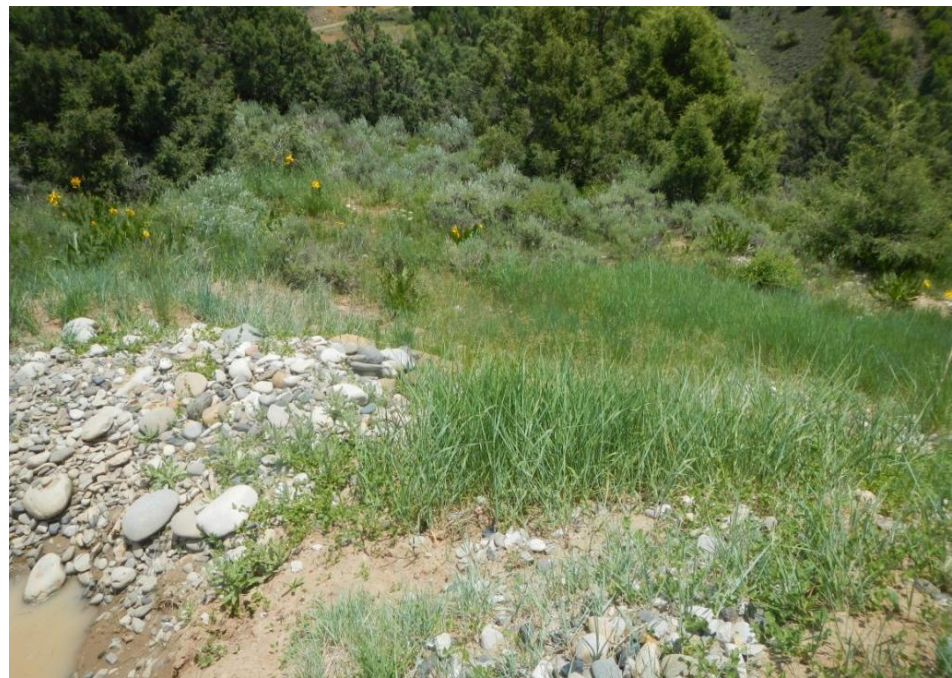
View of silt traps and culvert entrance along access road that appear to be functioning.
